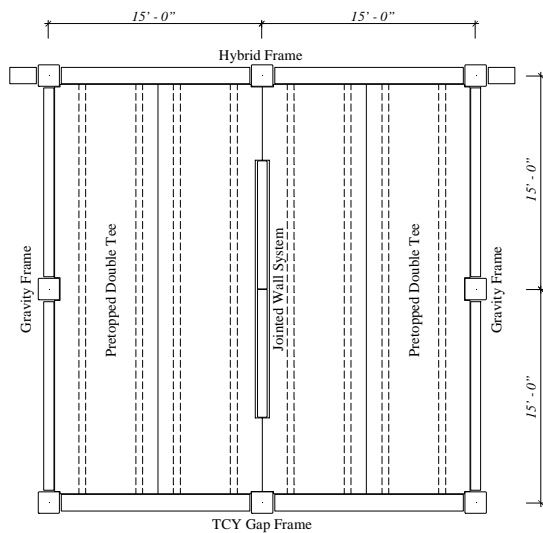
Floor plan of the test building at Levels 1 - 3.
